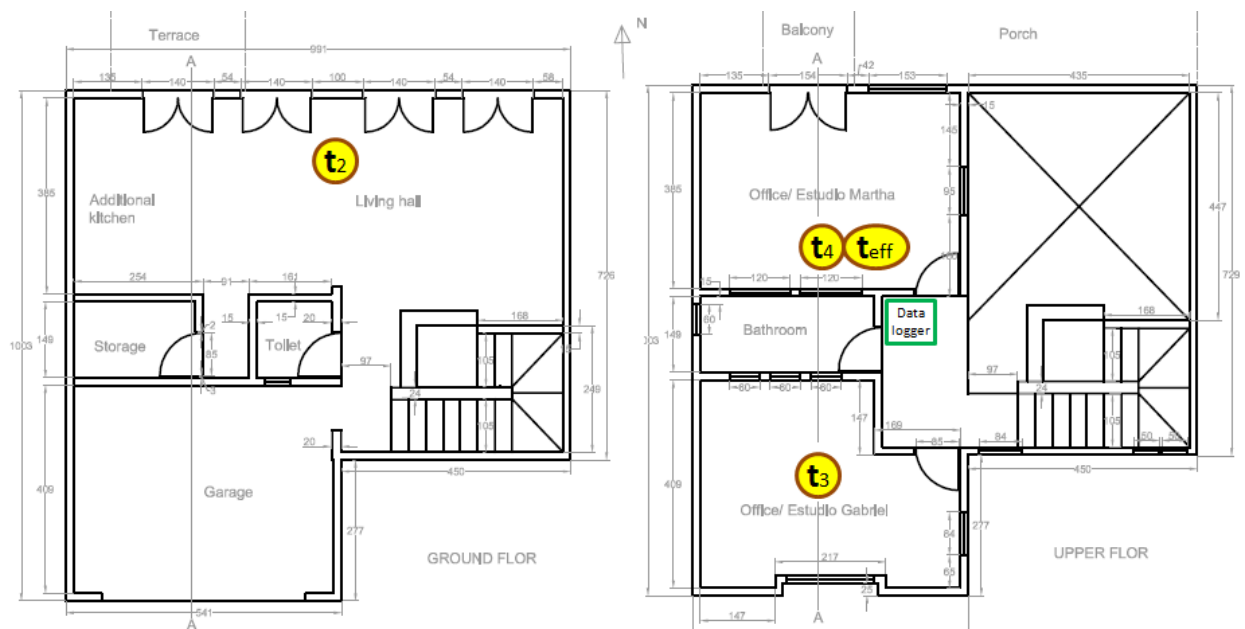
Arrangement of indoor PT 100 sensors in Casa Macías Villalobos, excerpt of construction plan
